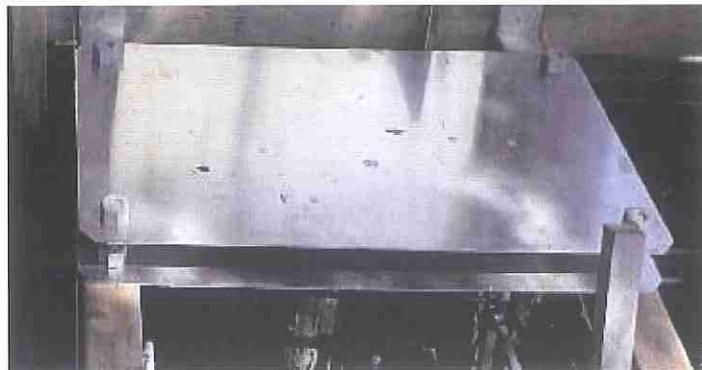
Example of Finished Anchor Bolt/Template Placement
